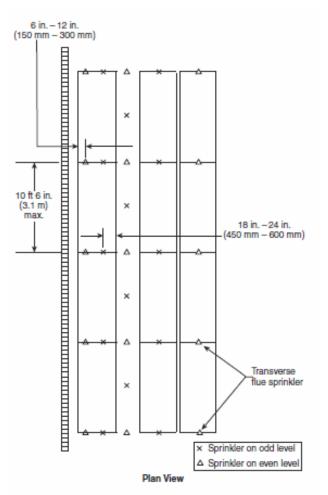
Sprinkler Location and Spacing in Transverse Flues.
